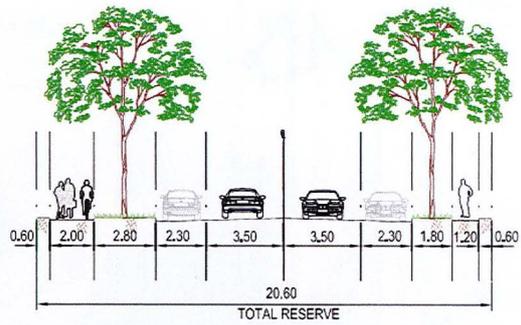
Road Type 5: Existing Local Street with Shared Path
